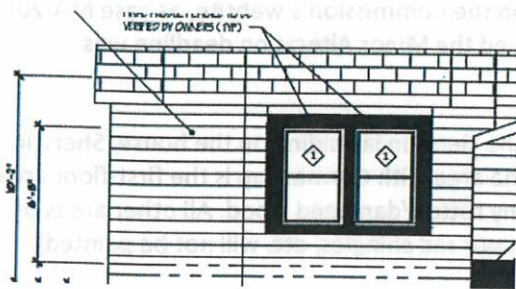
Corrected view of shed dormer to reflect siding instead of roofing shingles.
